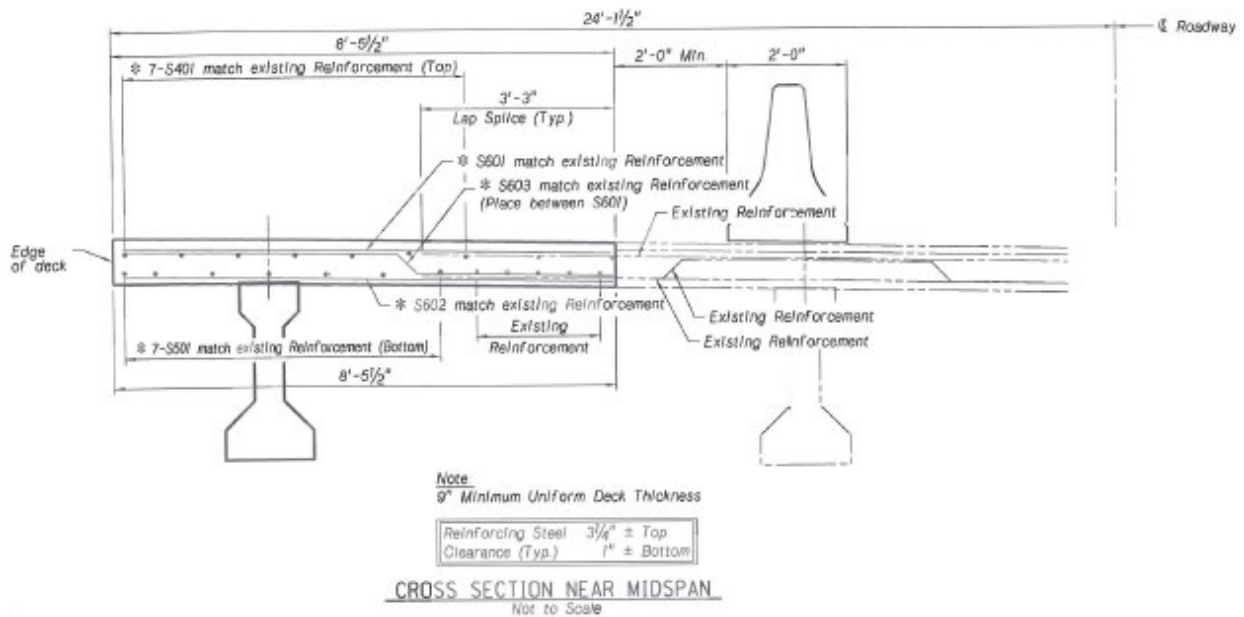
Girder replacement procedure, splicing deck reinforcement, from the repair documents of I-680 over US-75 Bridge, courtesy of NDOT
